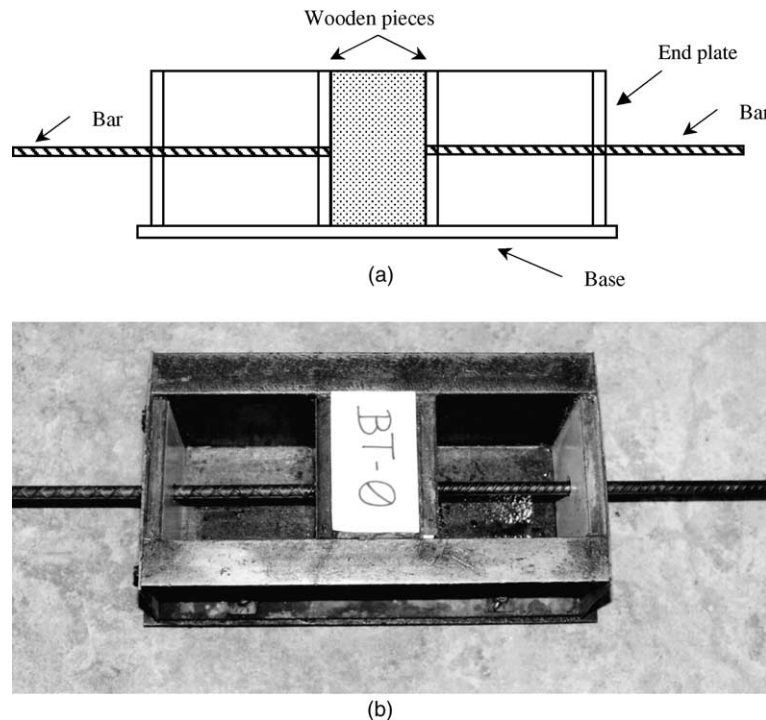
(a) Vertical section of mould for casting two bond specimens. (b) Photograph of the mold used with the bars in place.
